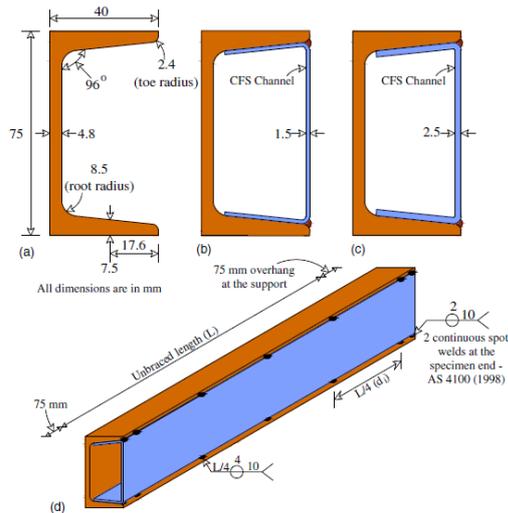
Test specimens: (a) control specimen; (b) retrofitted specimen with 1.5-mm-thick CFS channel; (c) retrofitted specimen with 2.5-mm-thick CFS channel; and (d) details of interconnection (spot welding) [11].
